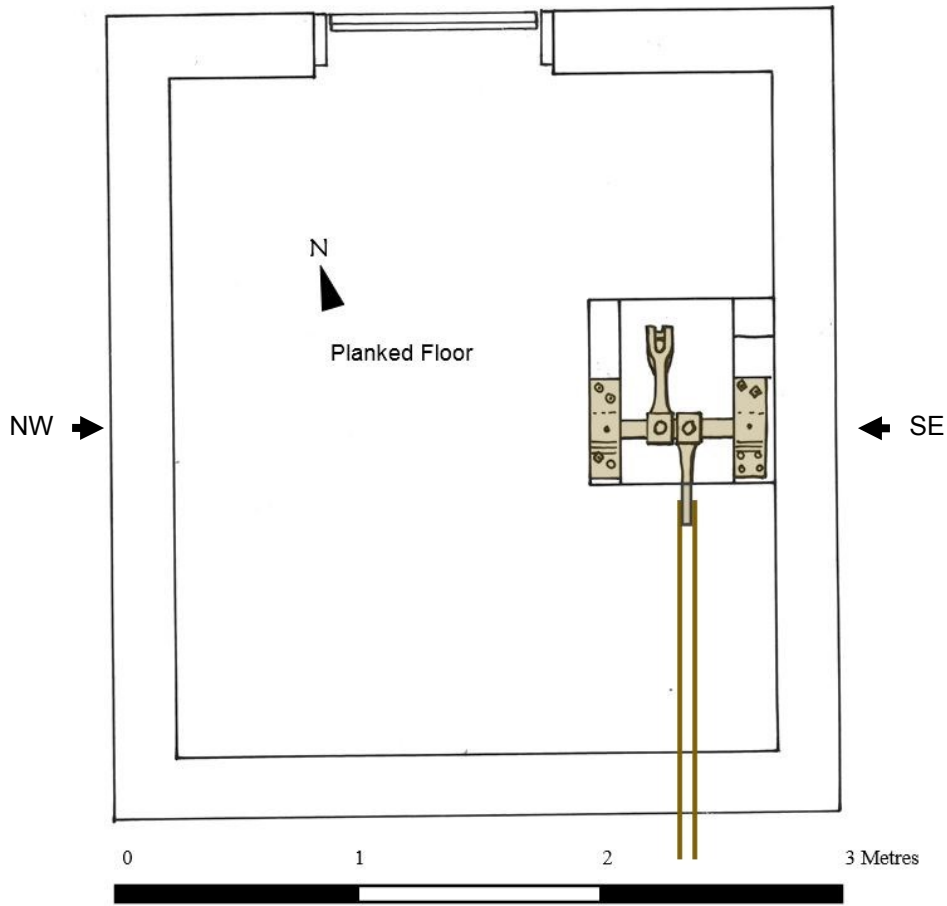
Ground-floor plan of the Brakeman's Hut showing brake transmission lever (formerly connected to wheel pit to the south) Location of figure 4 indicated.
